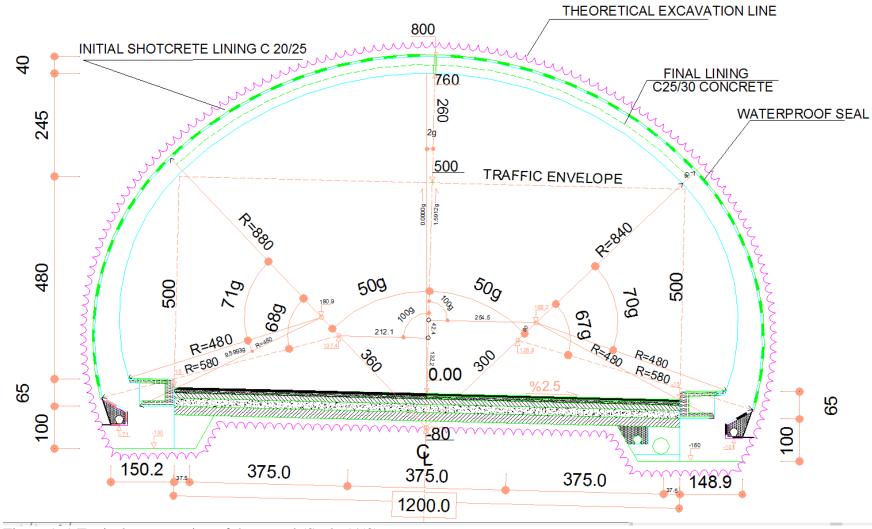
1 Typical cross section of the tunnel (Scale:1/50)
